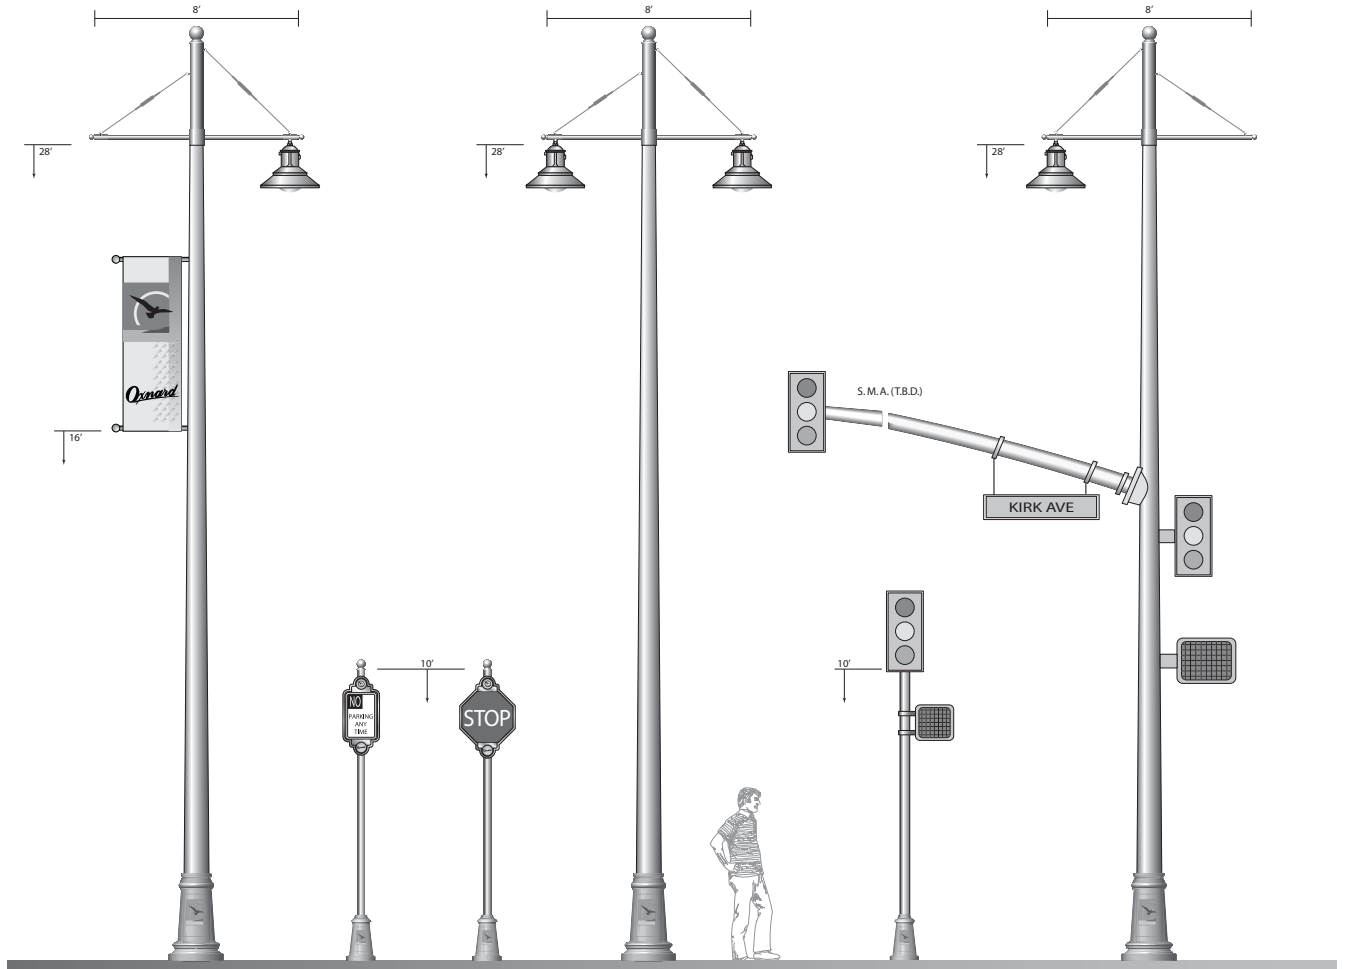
, Street Lighting/Sign Concepts, illustrates the thematic street lighting fixtures and street furniture proposed for the SouthShore Specific Plan Area. These elements – which include street and traffic control sign posts, bollard lights, and other items shown – were designed for the Project to accent SouthShore’s coastal location and identity.
